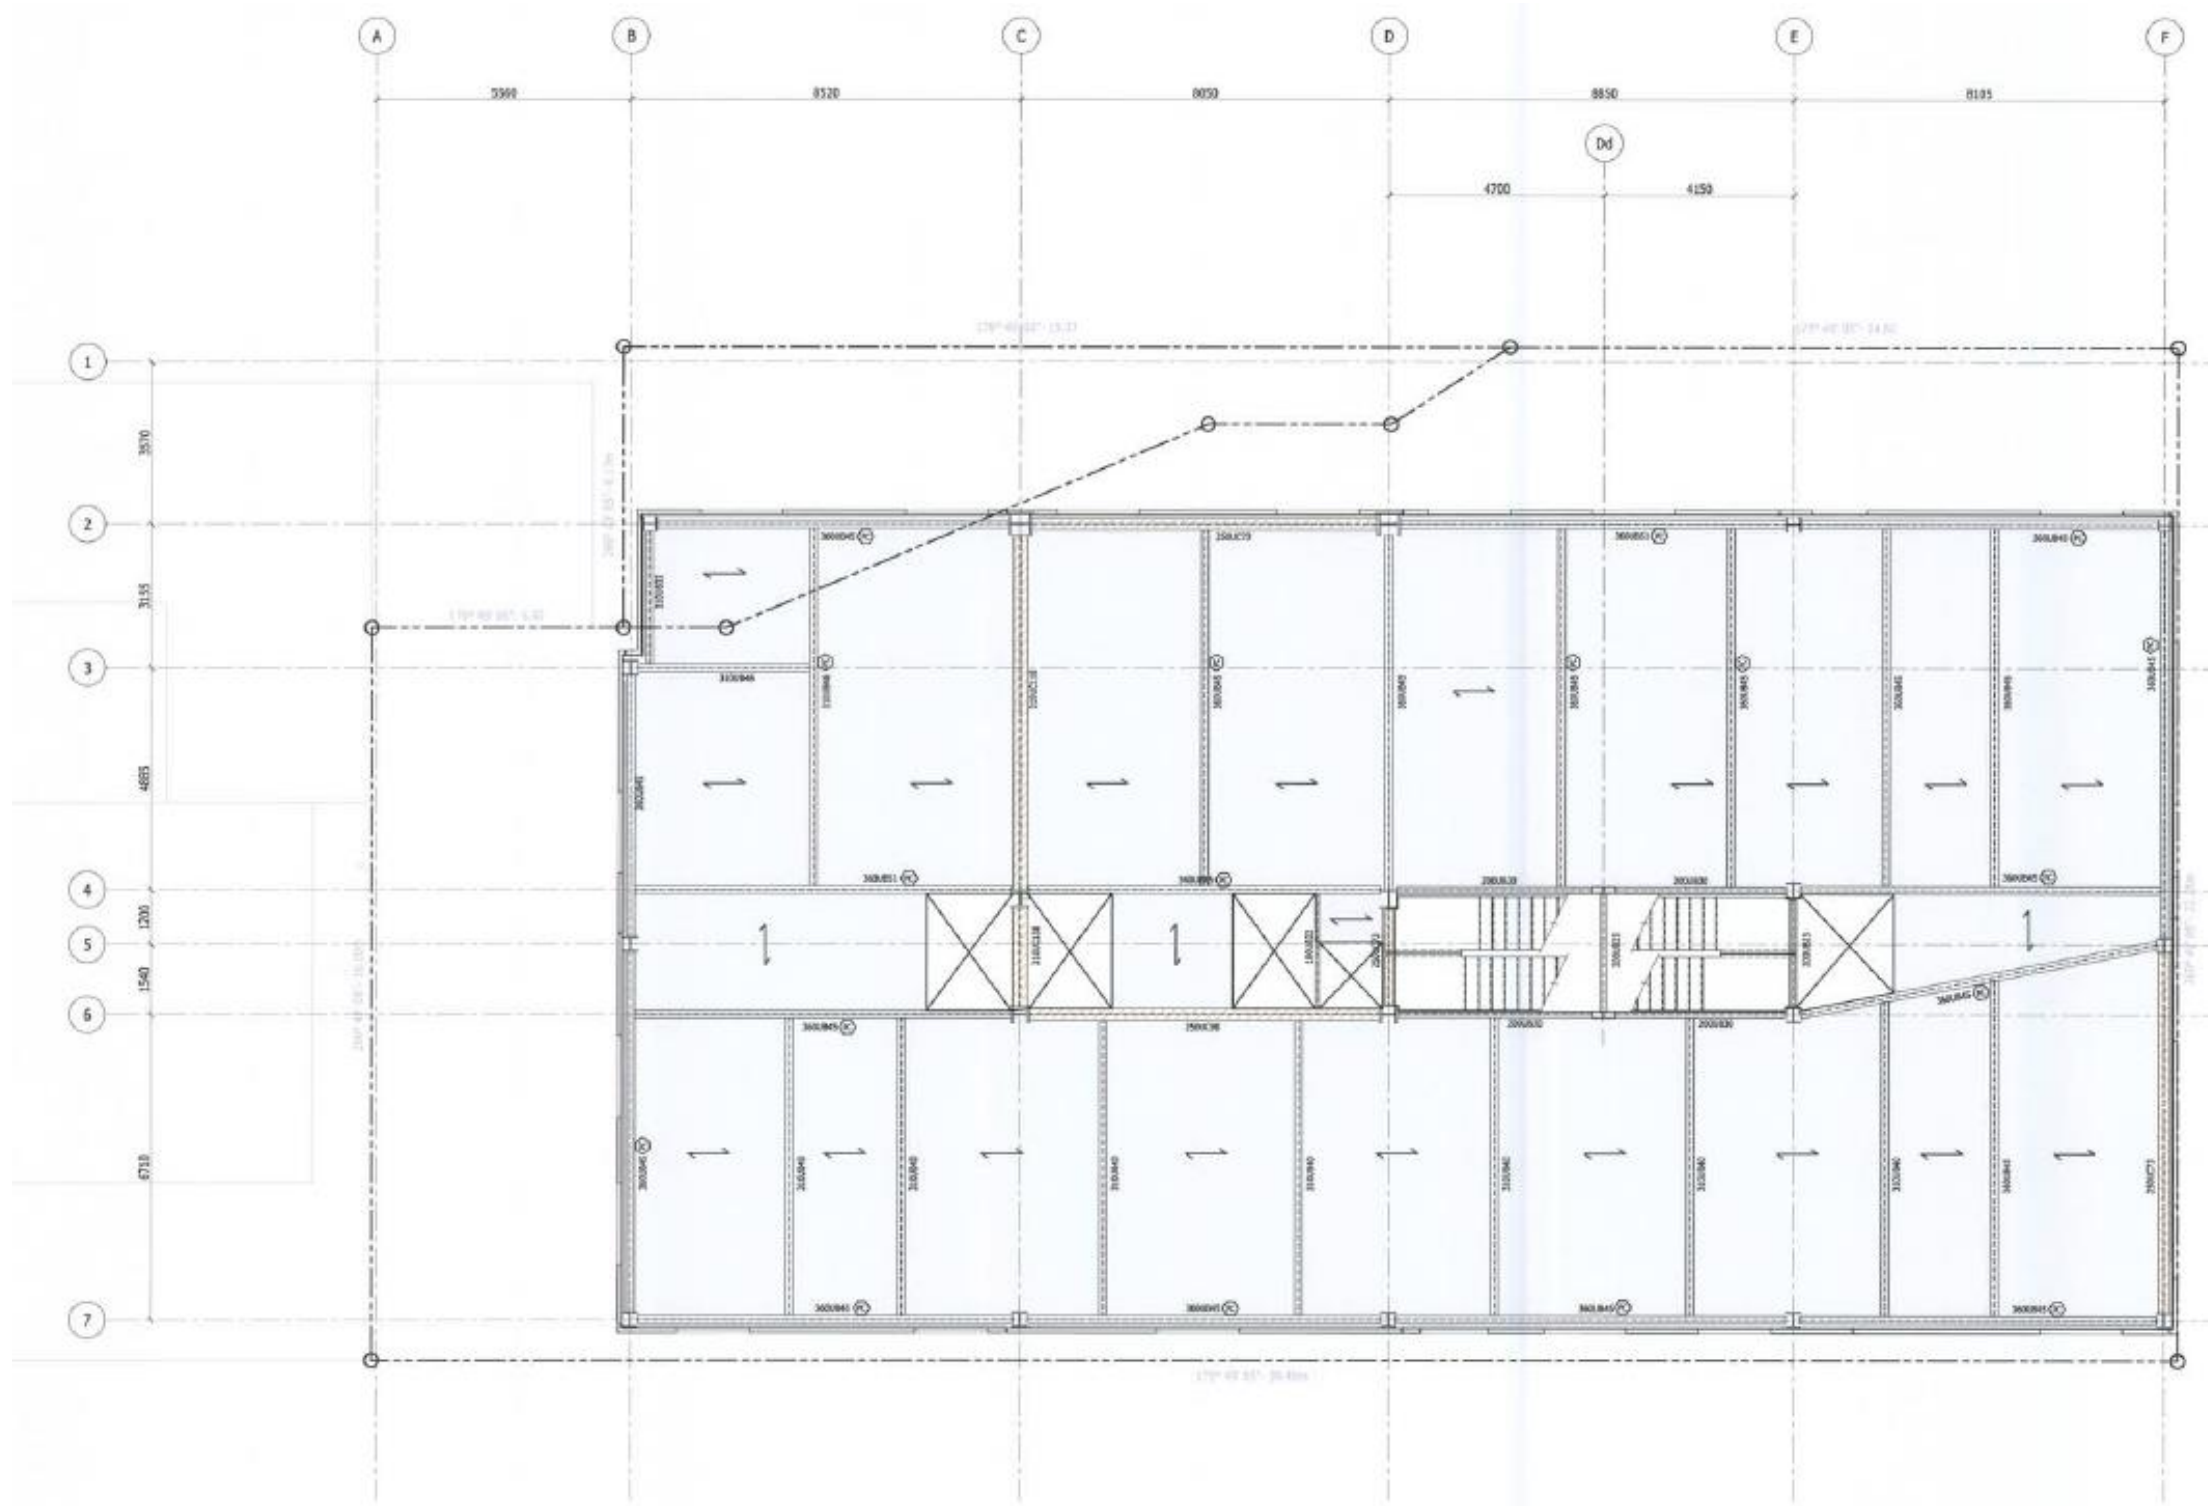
Structural Plan Level 8 (Christchurch City Council 2016c)
